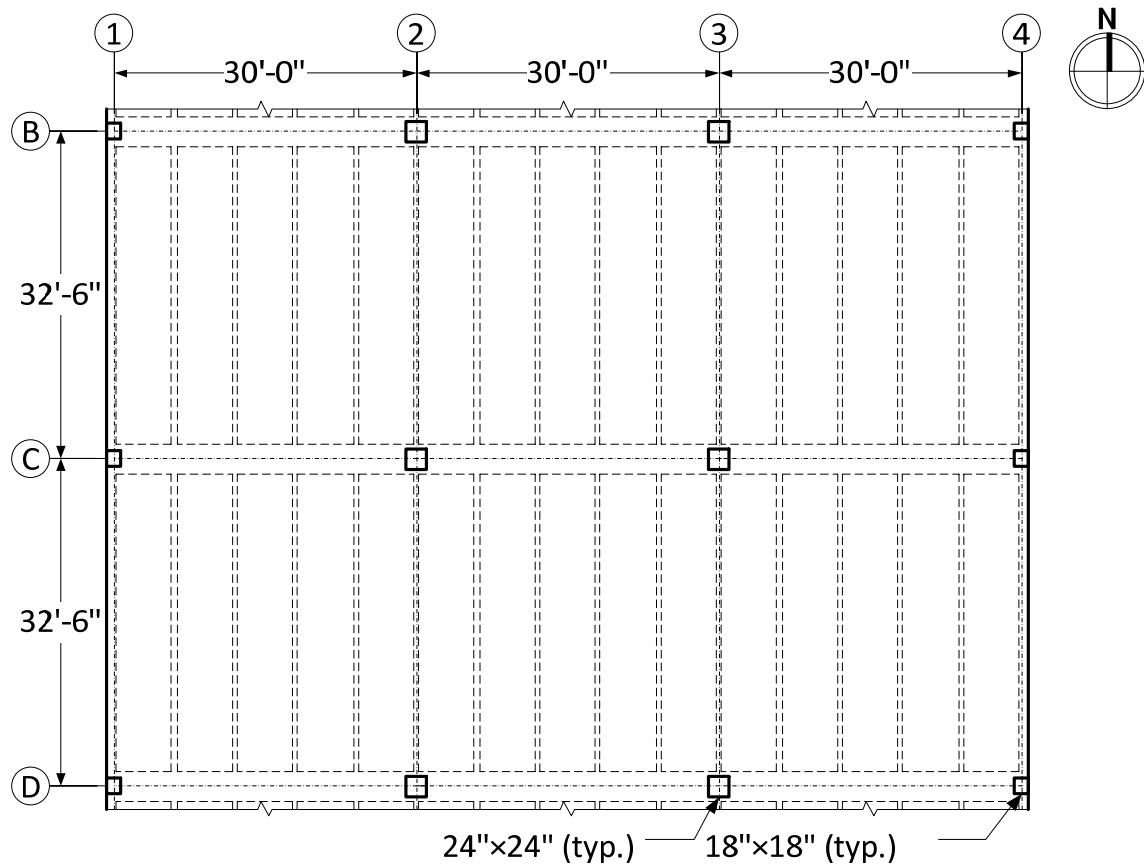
One-way Joist Concrete Floor Framing System (Partial Plan)
